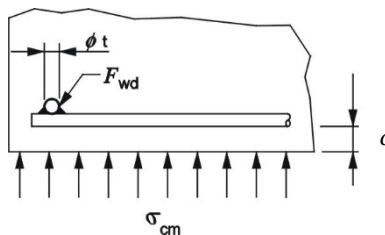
Welded transverse bar as anchoring device
